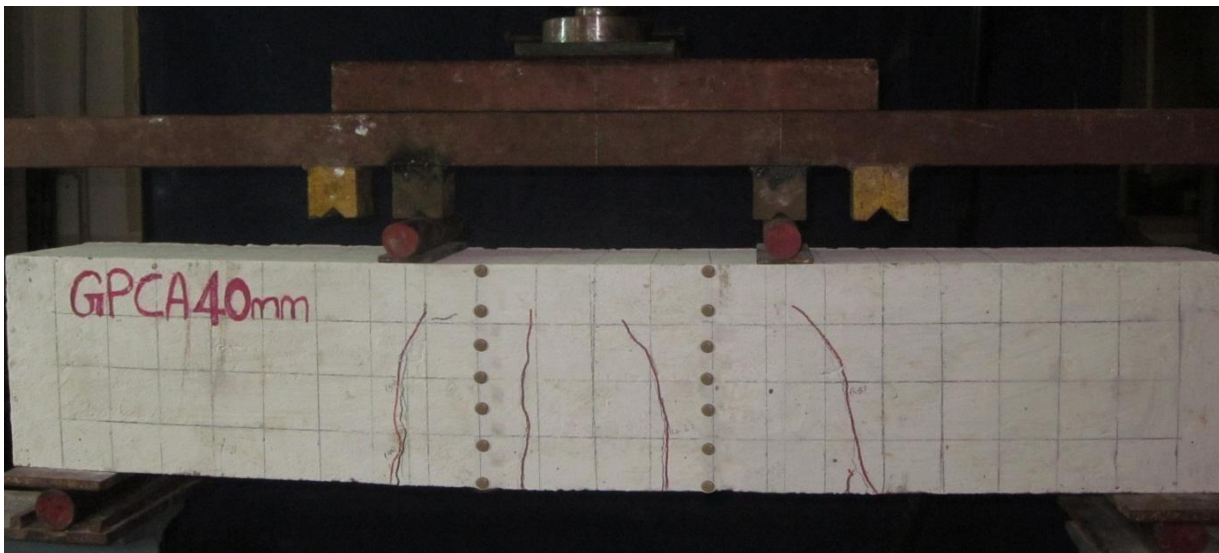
Crack pattern of GPCA 40mm specimen
